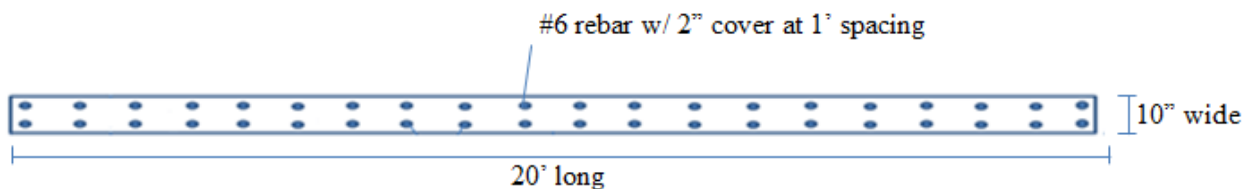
Plan View of Wall Showing Geometry and Reinforcement
